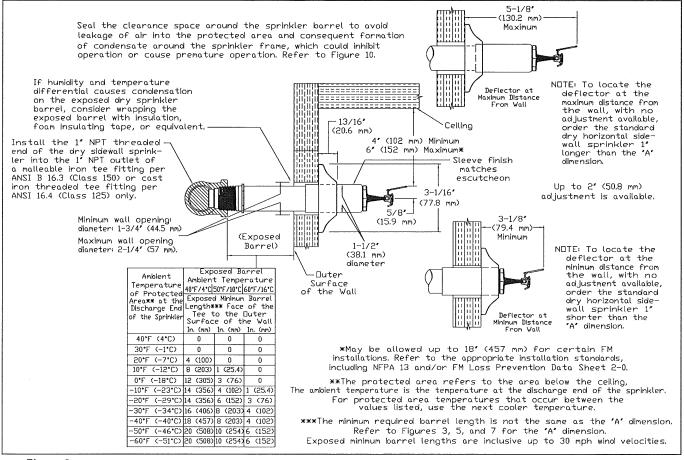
Dry Horizontal Sidwall Sprinkler Required Minimum Barrel Length Based on Ambient Temperature in the Protected Area (Adjustable Standard Dry HSW Sprinkler is Shown)
